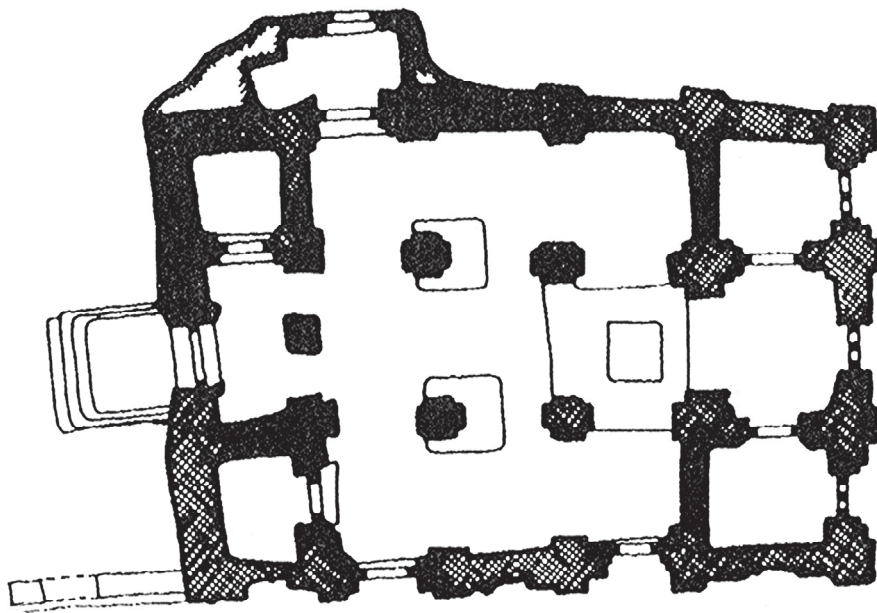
Church of Wəqro Mäsqäl, Säqota, Wällo, floor plan; after L. Bianchi Barriviera
